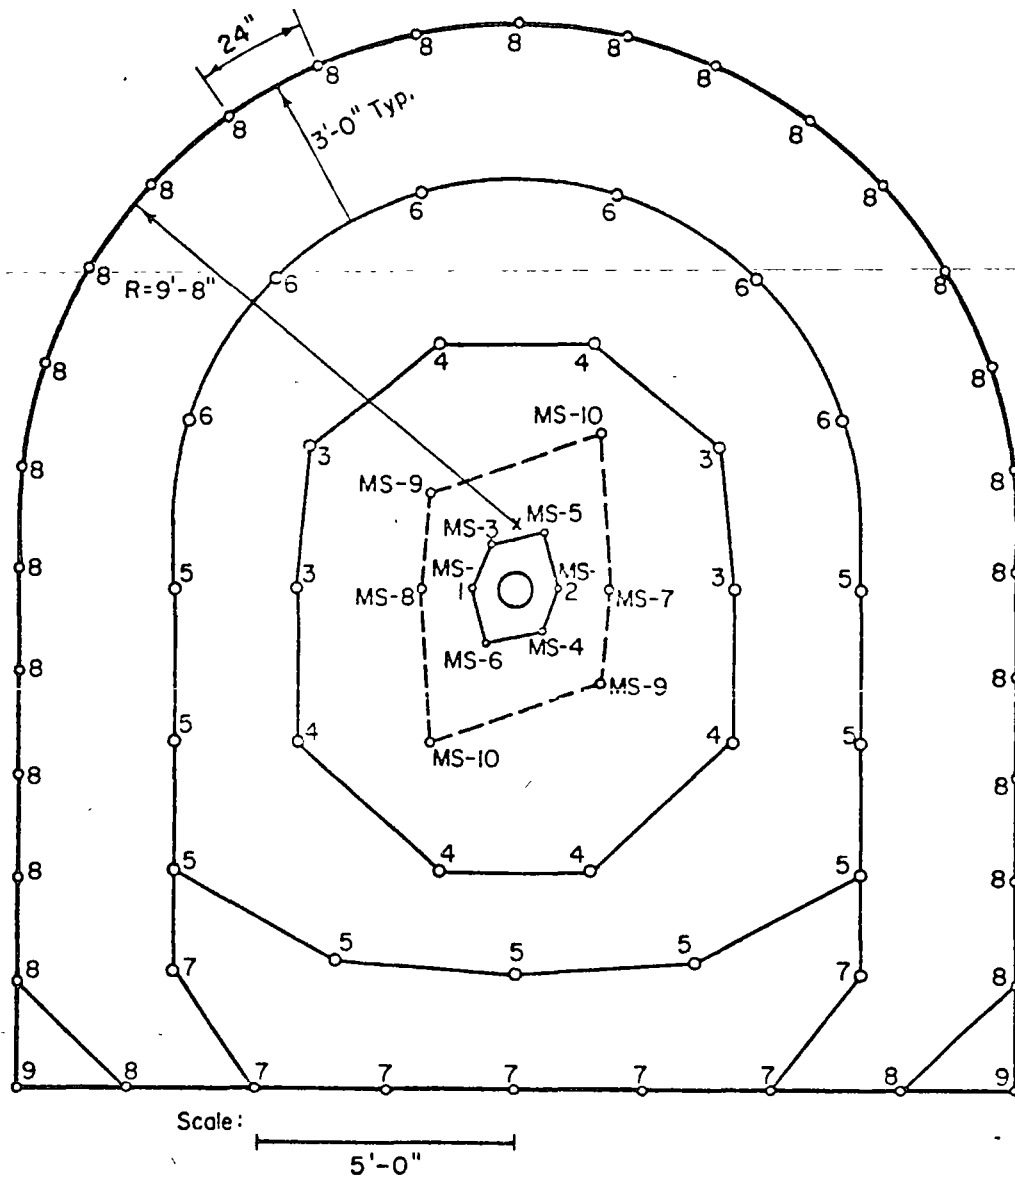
Typical Smooth Wall Tunnel Round (After Deere, 1972)
